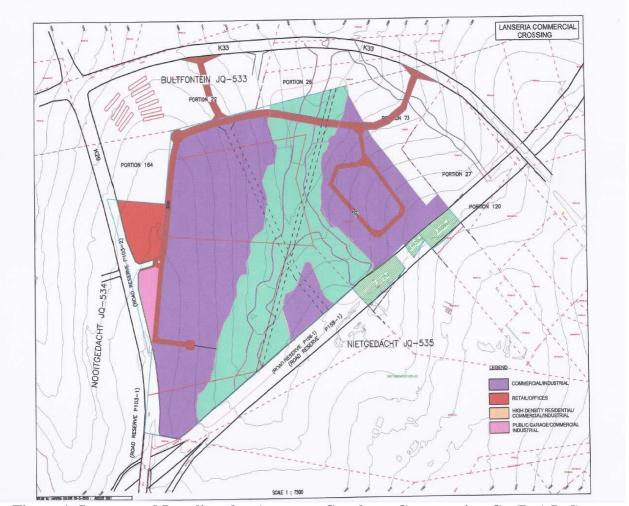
Layout and Locality plan (courtesy Cavaleros Construction Co (Pty) Ltd).
